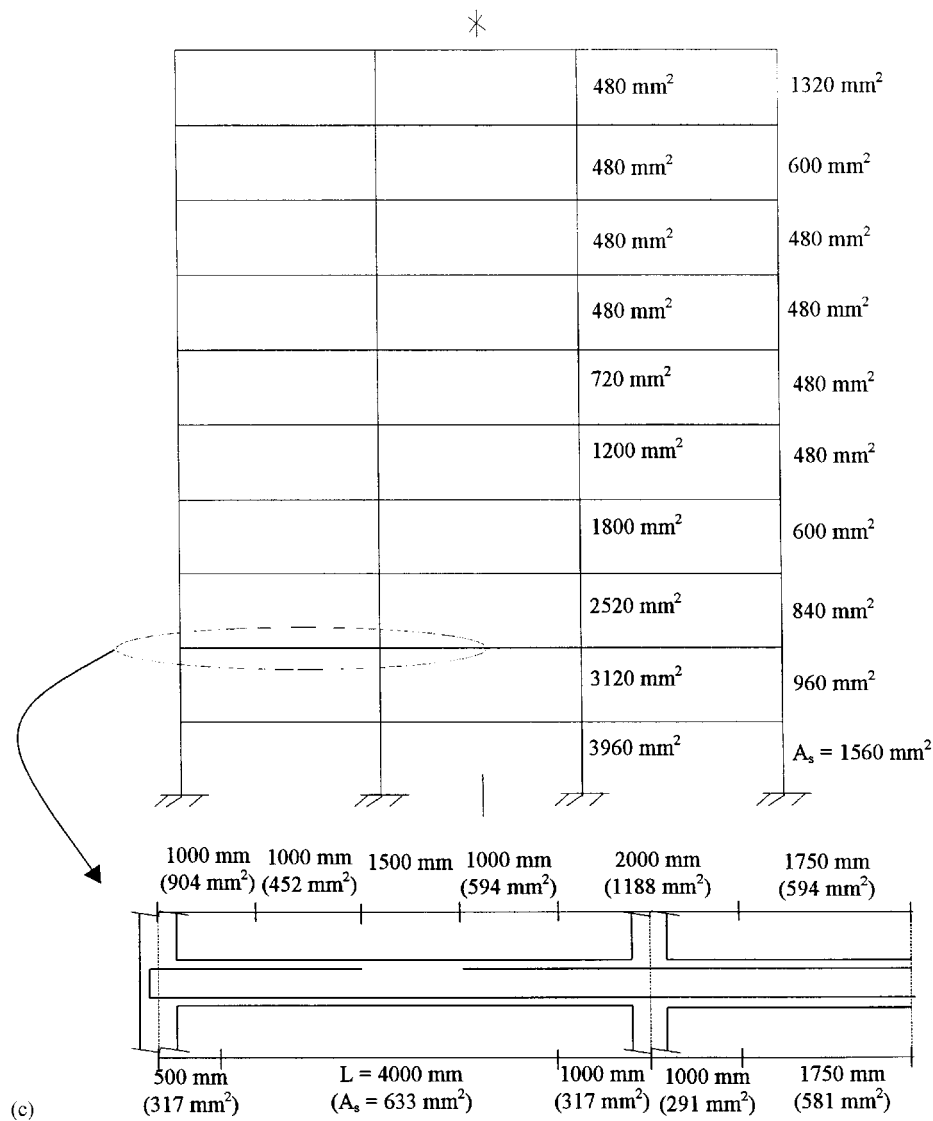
(c). Column and beam reinforcement for ten-storey frame
